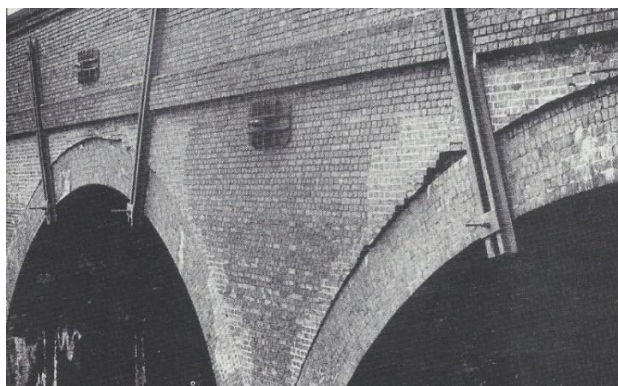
Tie-bars and spreader beams used to stabilize spandrel walls (Sowden and Jones, 1990).
